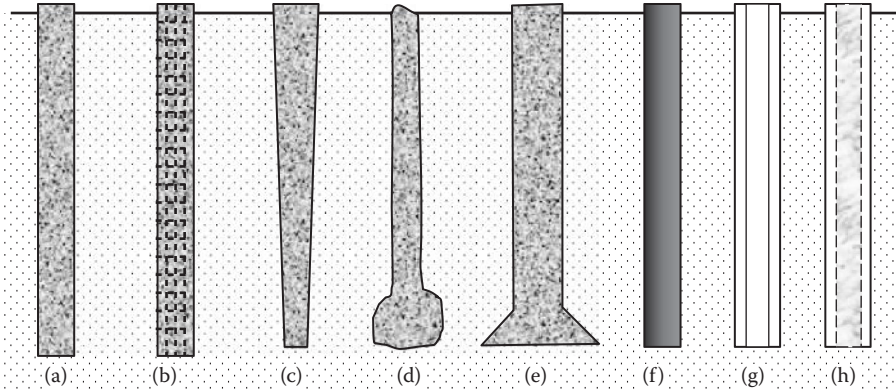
Shapes and materials of piles. (a) straight non-reinforced concrete pile, (b) straight reinforced concrete pile, (c) tapered pile, (d) uncased Franki pile, (e) concrete pile with enlarged base, (f) steel pipe pile, (g) steel H-section pile, (h) concrete-filled steel pipe pile.
